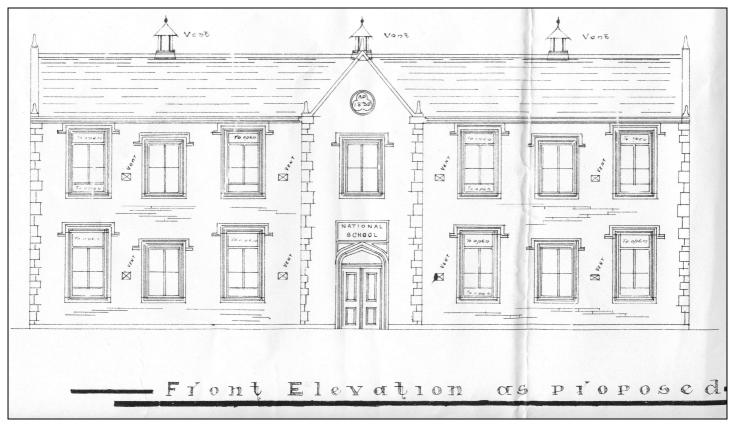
Drawings showing existing front elevation and proposed alterations, 1907. Architect not known; plan approved 5th April 1907. Reduced from original scale of 8 feet to 1 inch (1:96).
